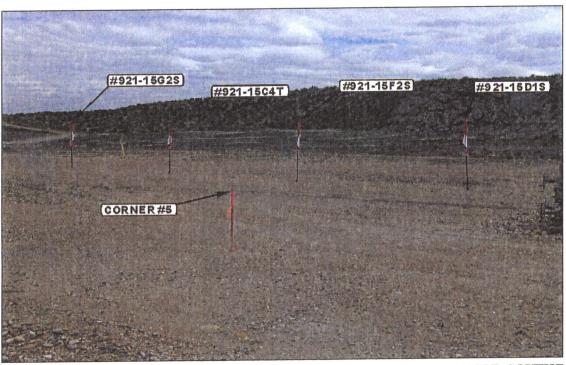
PHOTO: VIEW FROM CORNER #5TO LOCATION STAKES
